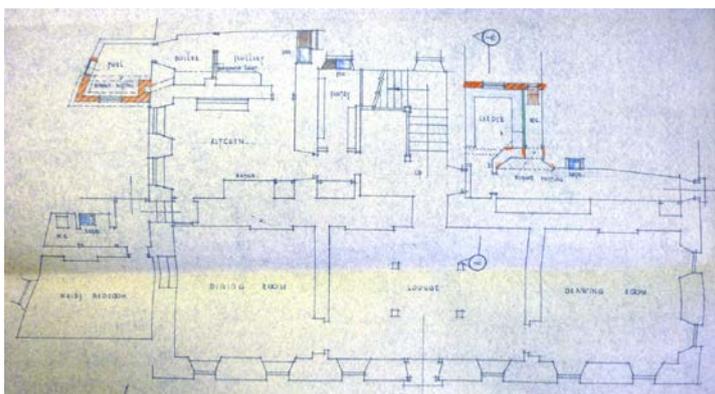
Proposed alterations and additions to the ground floor, 1940 (CAC(W) SRDE/3/PLANS1/497 1940)
